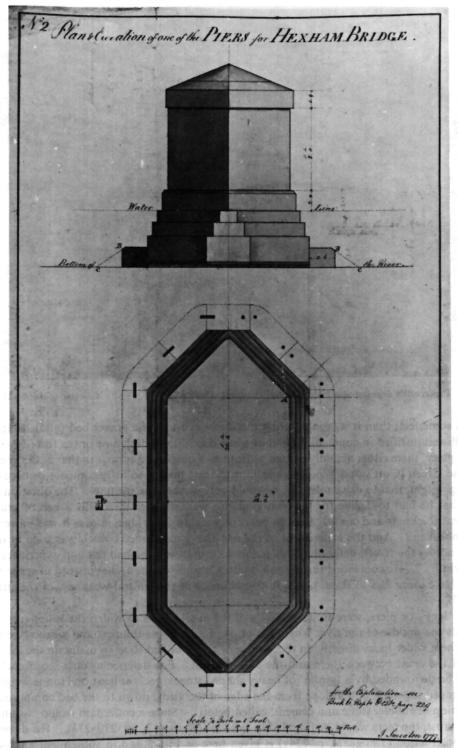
Smeaton's design for a caisson pier 1777 (Design 1)
